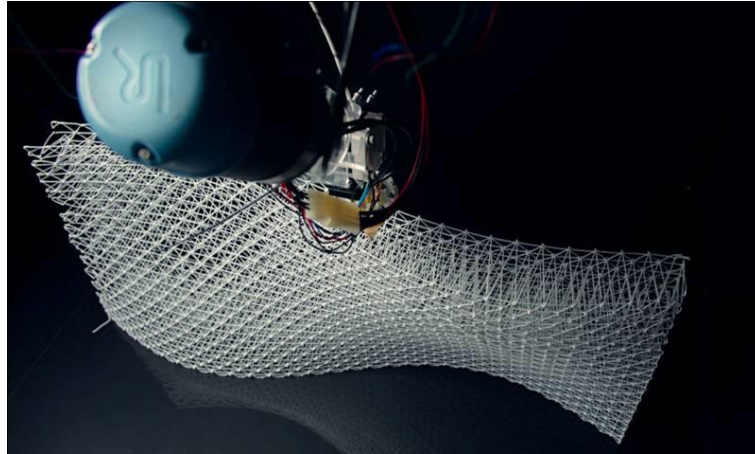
ETH Space Frame 3D printing - mesh mold.
